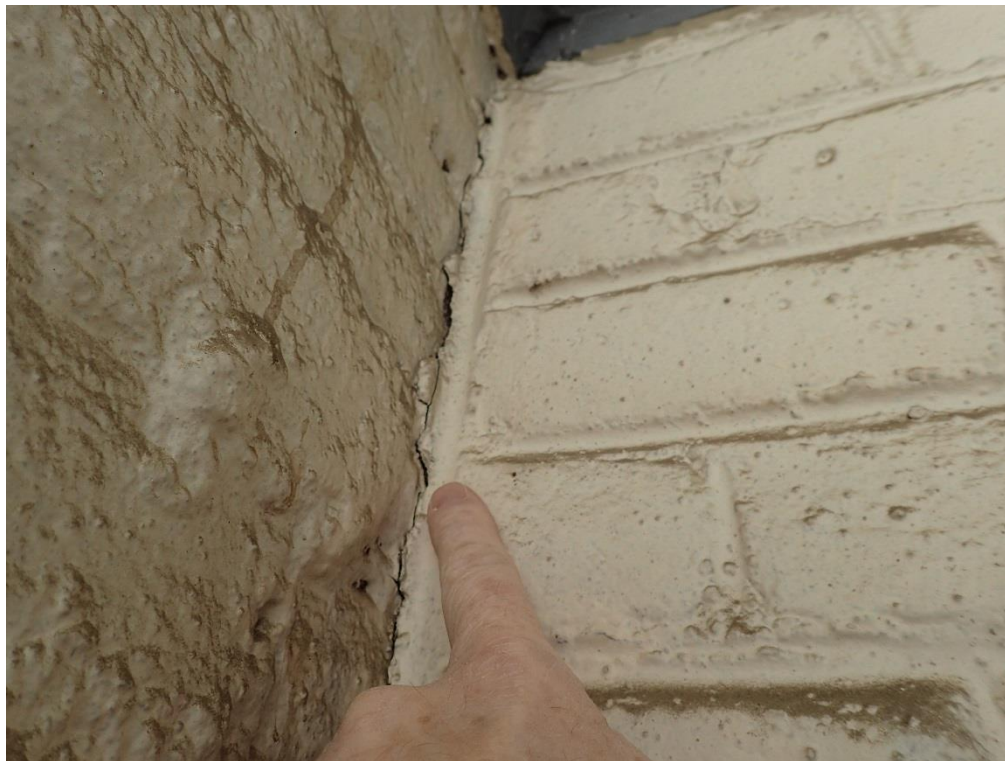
Vertical cracking between façade and perpendicular wall
